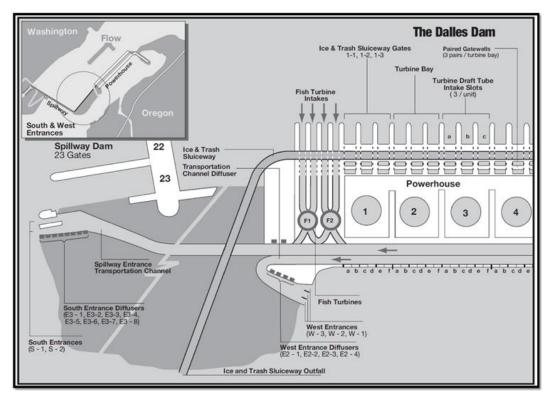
The Dalles Dam South and West Fish Entrances for the East Fish Ladder
